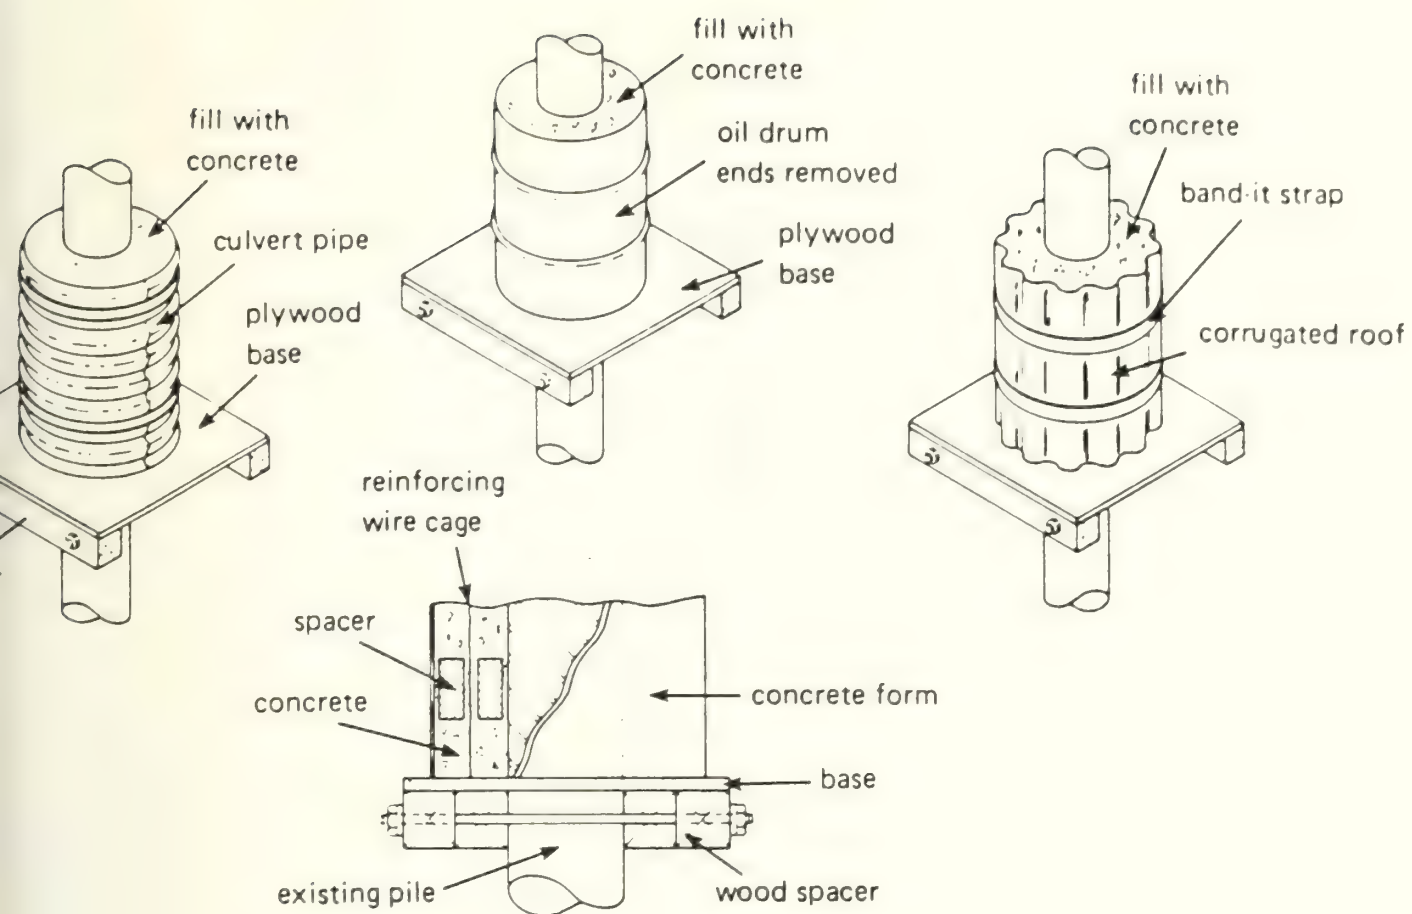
Alternative Forming Methods for Concrete Encasement
